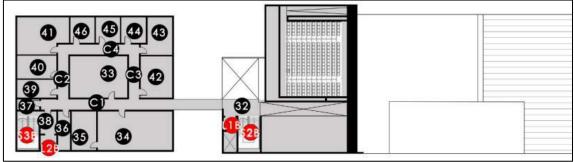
Re-drawn second-floor plan (Source: CREW - Cremonesi Workshop (2015)).
